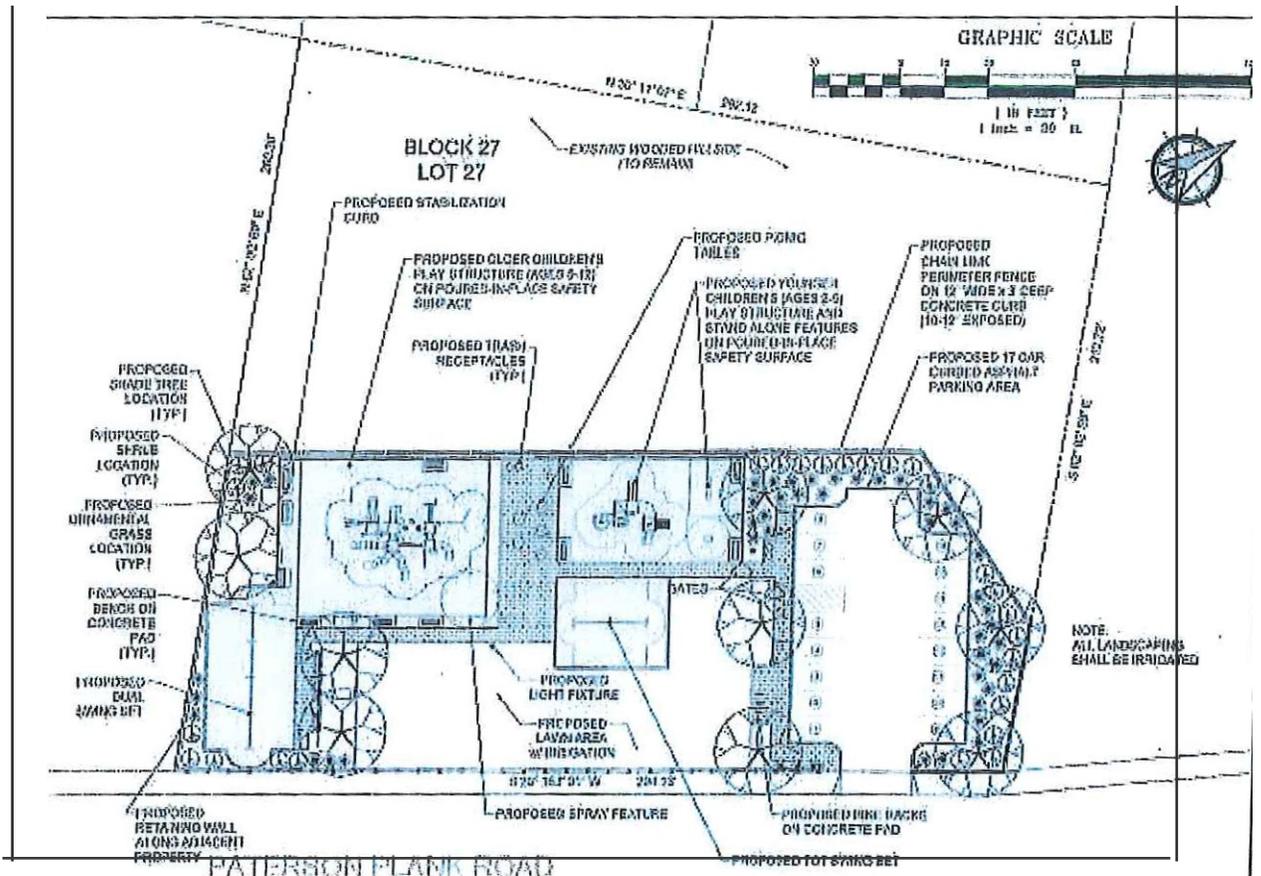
Conceptual plans for development of replacement site on Paterson Plank Road.
